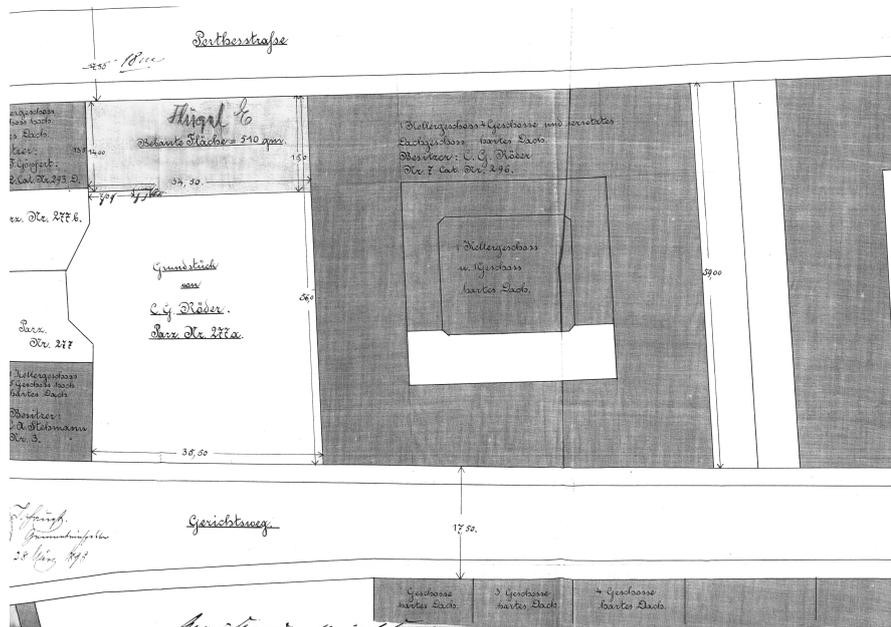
Plan of C. G. Röder's printing shop. The quadrangle in the centre are the wings already existing, "Flügel E" at the upper left is the Hennebique-wing of 1898. Later on Pommer built wings at the Gerichtsweg and connecting this to Flügel E to form another rectangle, its courtyard was roofed and used also for printing; (Bauakte, p. 104).
